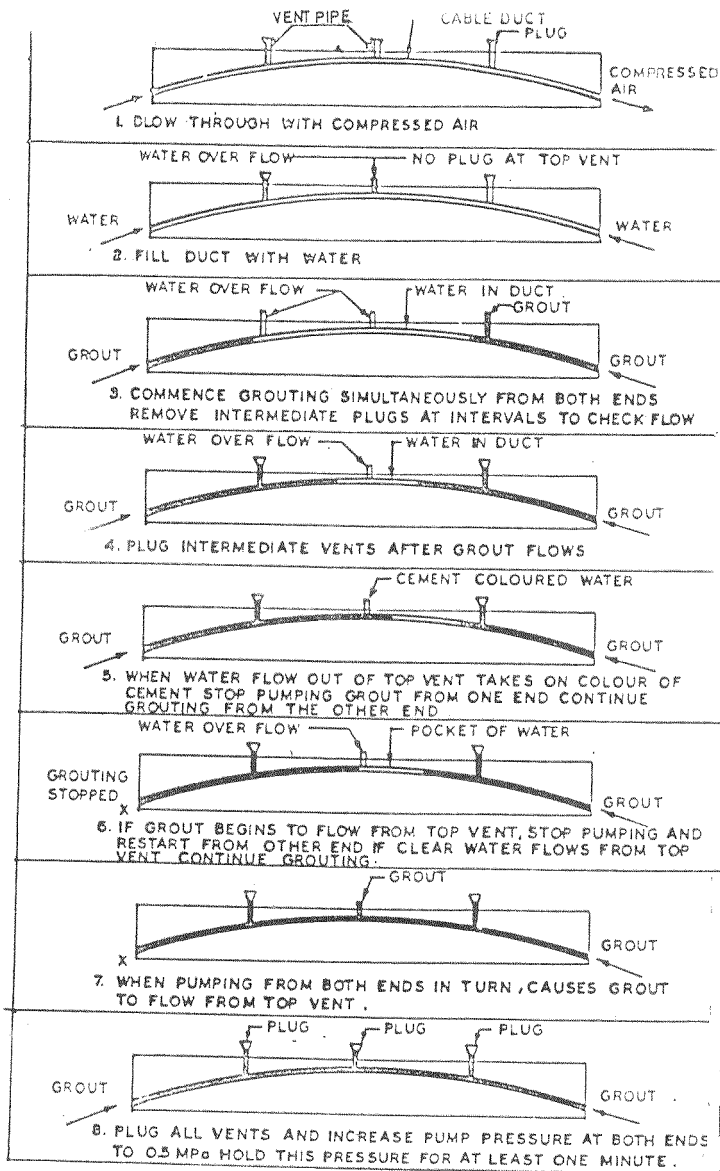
/III-1 : Procedure for Grouting of Cables Draped Downwards
